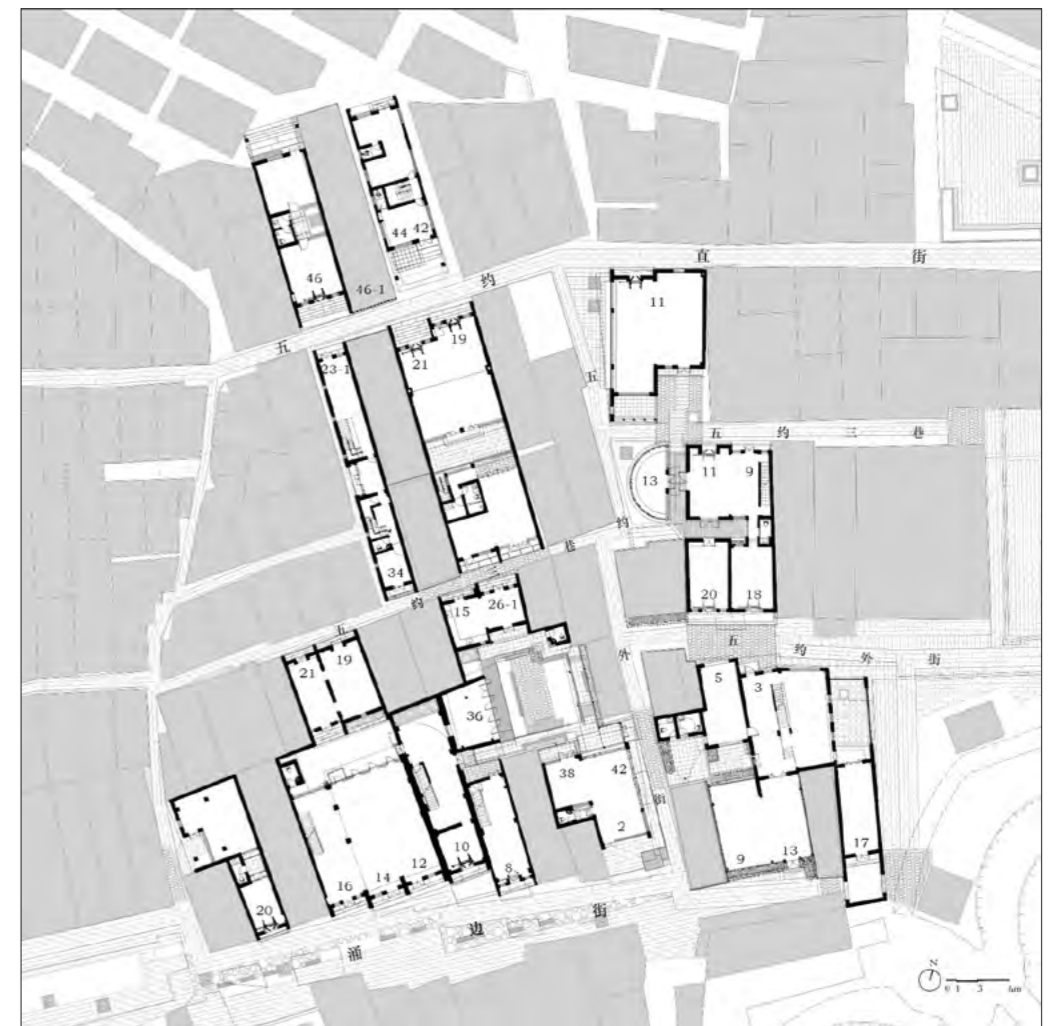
Floor plan of the micro-renovation area of Poon Tong Ng Yeuk
